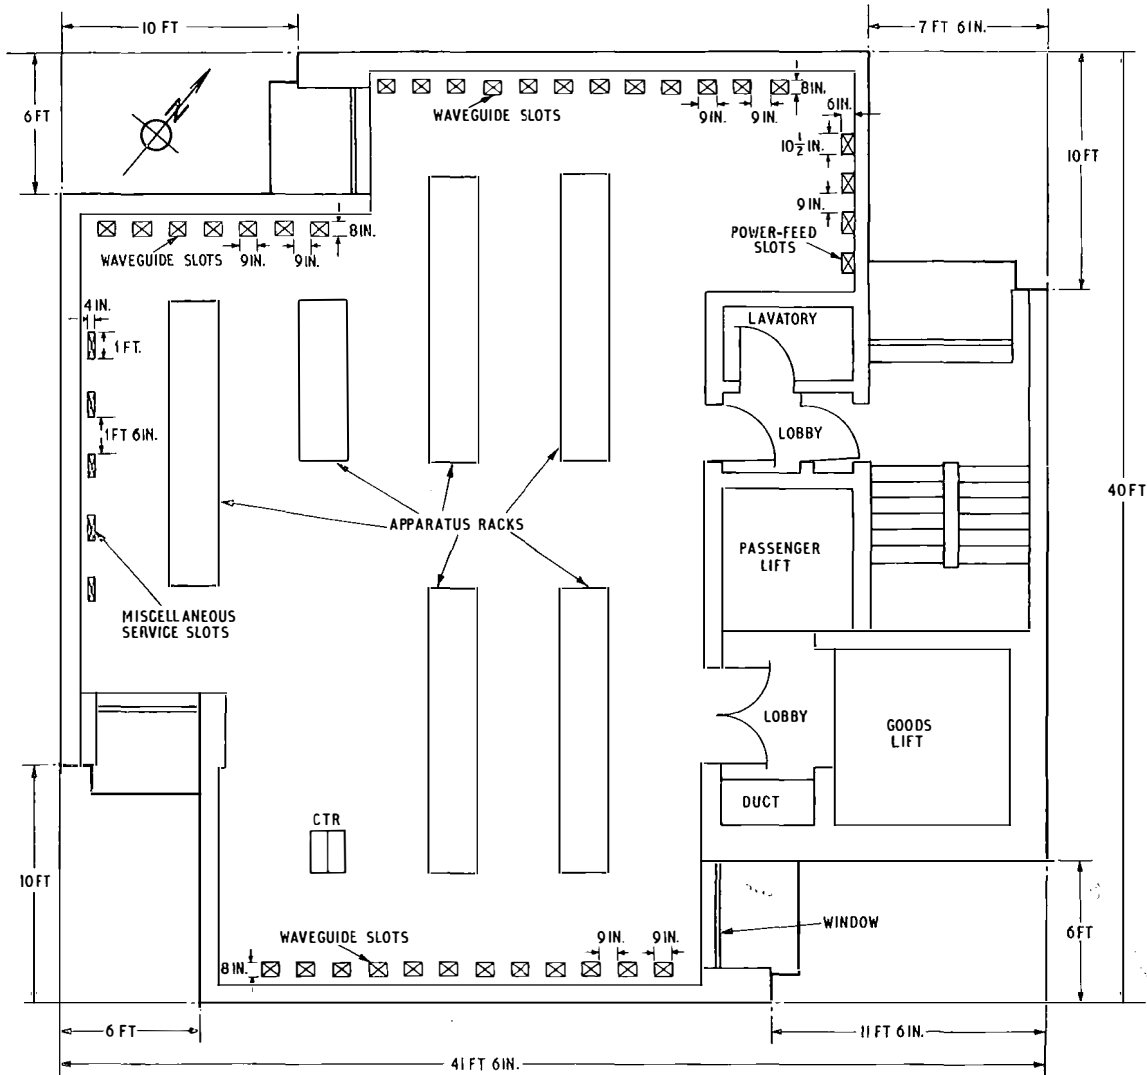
TYPICAL APPARATUS-ROOM FLOOR PLAN
